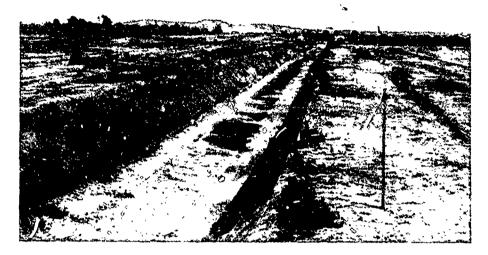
Right Abutment inspection trench looking east (Upstation)
